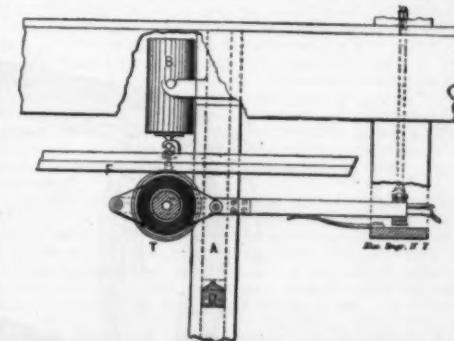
FIELD'S ELECTRIC RAILWAY CONDUIT.
